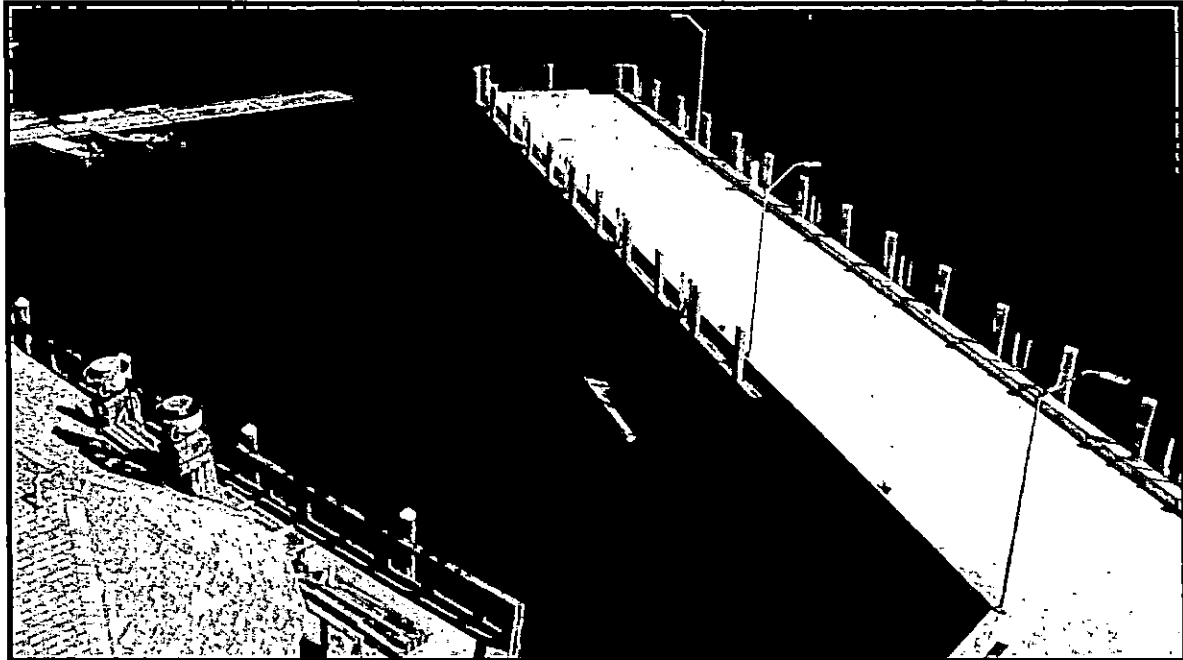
Portion of Area 3 (State Park) Proposed Pier Location Options Concept Plan
